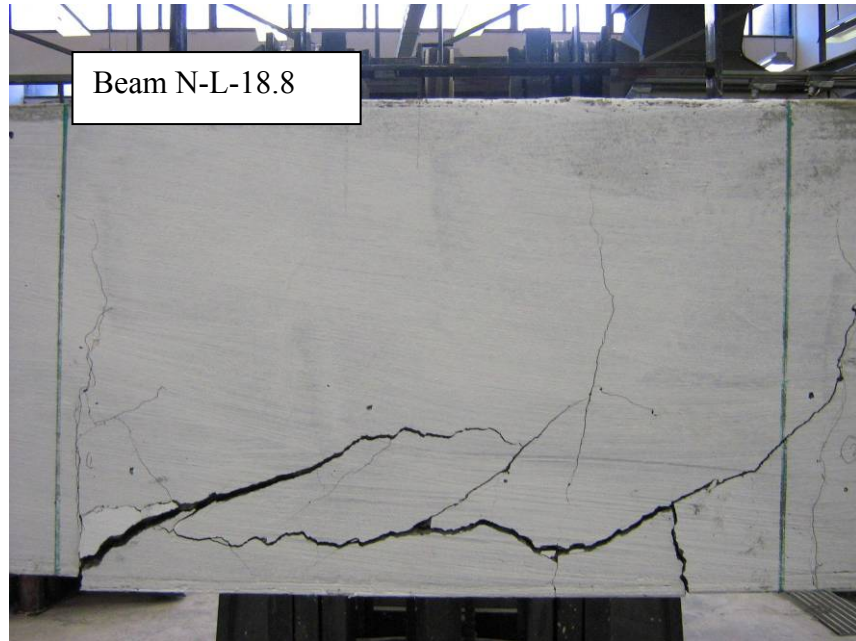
Crack Pattern for Beam N-L-18.8 and H-L-18.8 (Side View)
